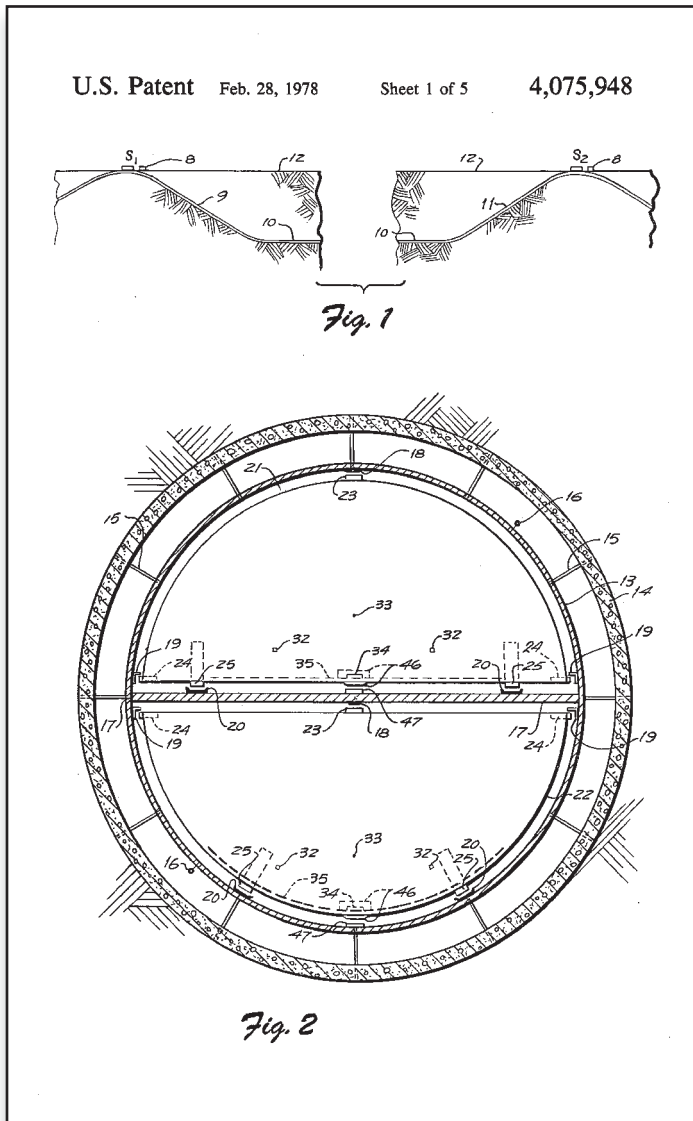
illustrates a vertical longitudinal cross-section of a representative underground tunnel path connecting two adjacent stations S1 and S2 and FIG. 2 is a transverse cross-section of the outer tunnel and inner, split-level vacuum tunnel mounted inside and containing upper and lower level cars.
